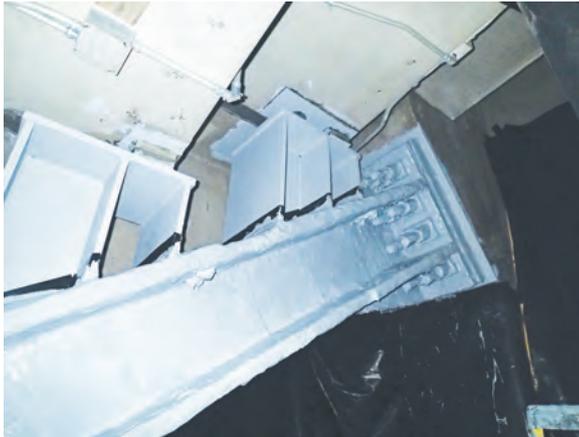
Raker truss tieback anchor connection—completed repair with epoxy intumescent fireproofing to achieve 3-hour fire rating and provide corrosion protection to the beam and threaded rebar anchors.
